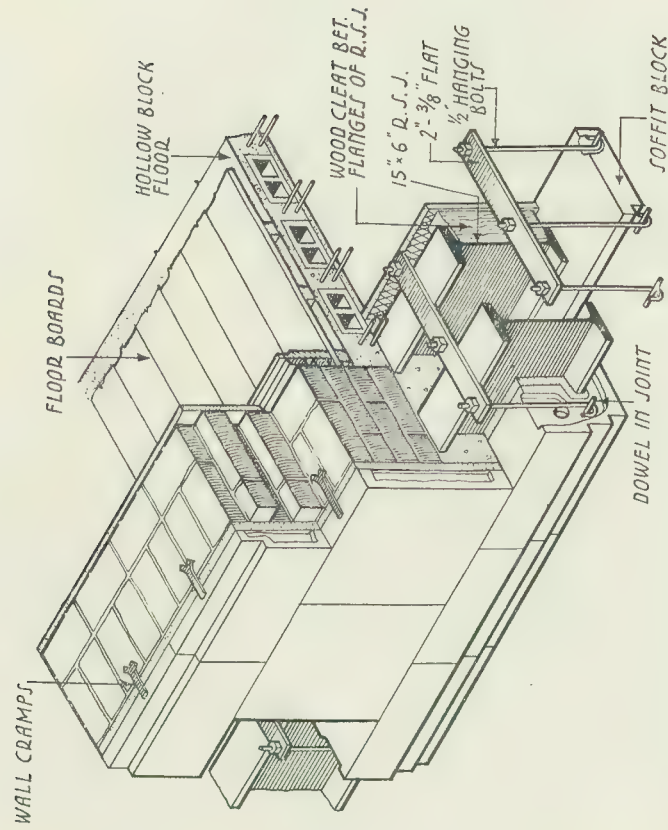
TERRACOTTA FACINGS SUPPORTED UPON STEELWORK
